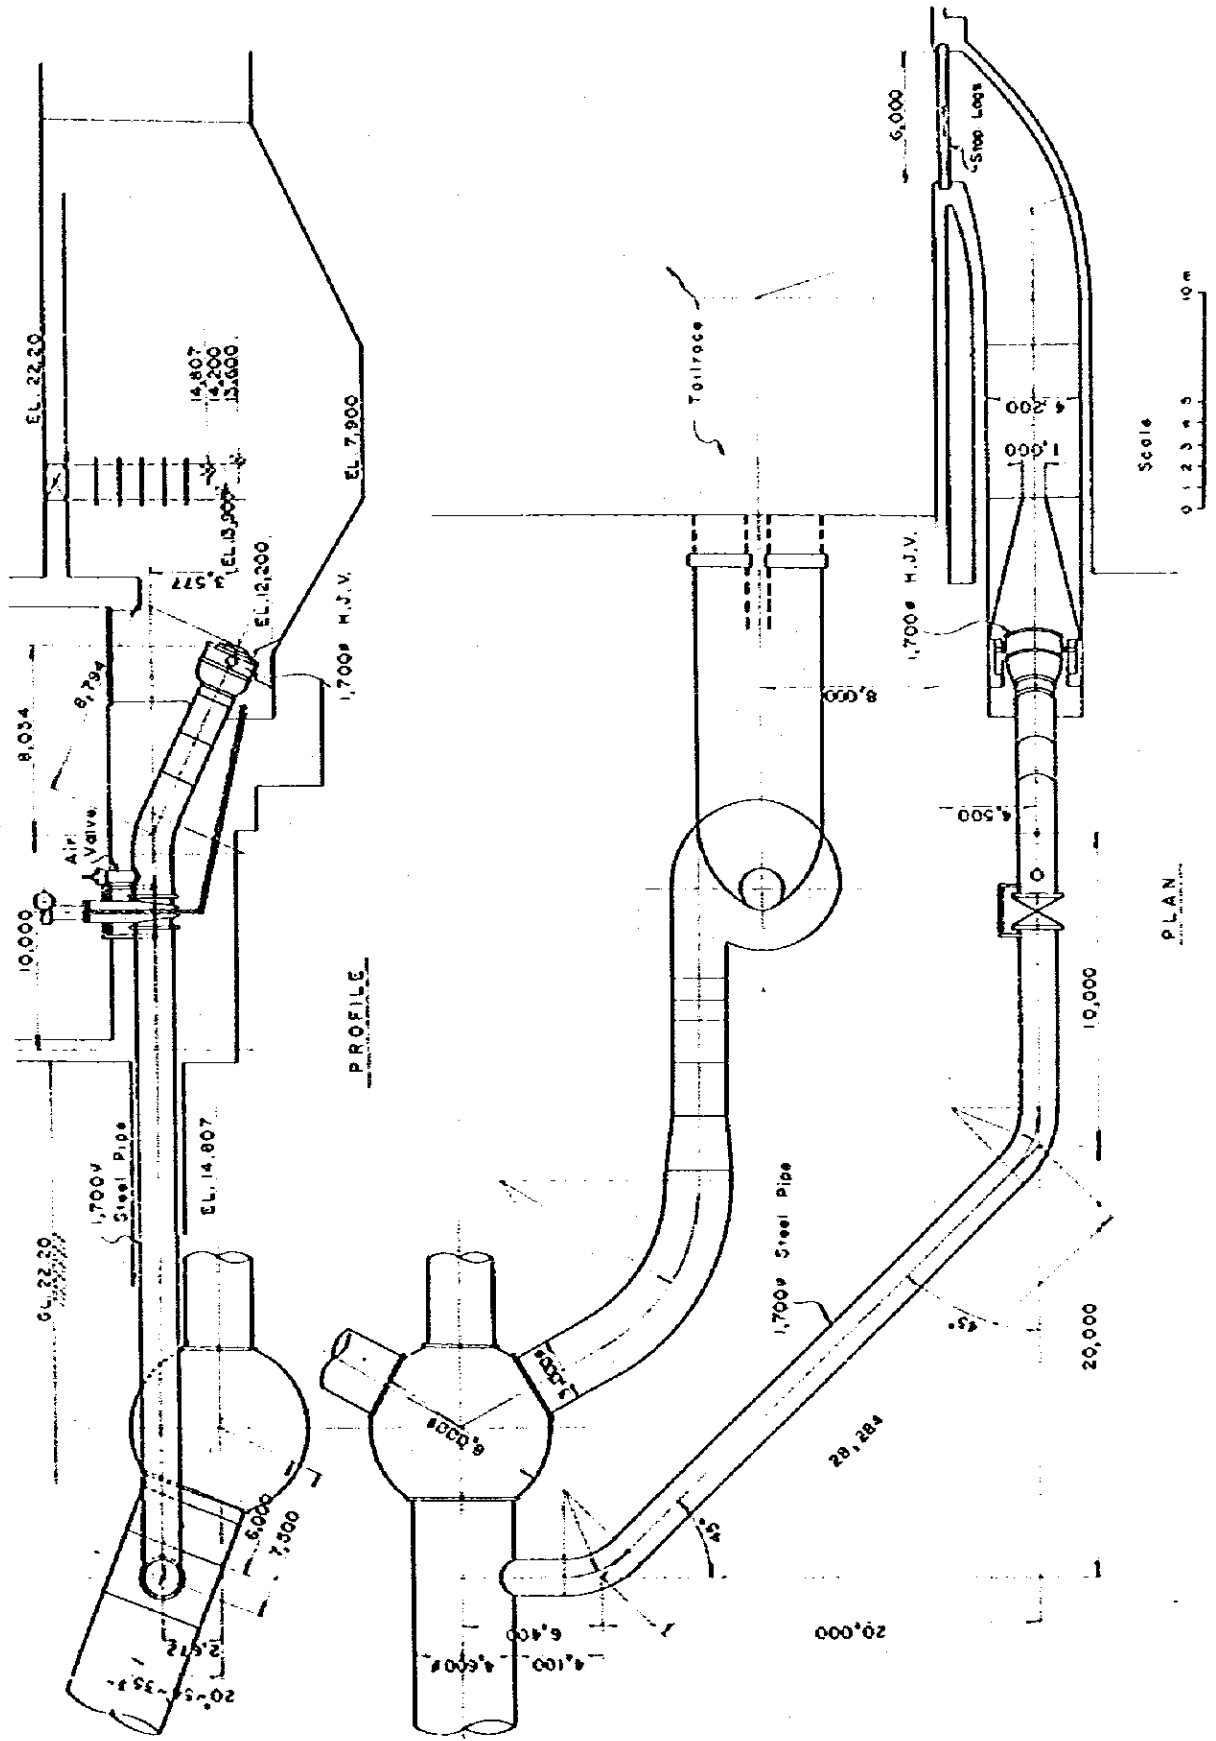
Proposed Plan of By-pass Structure Case - II
